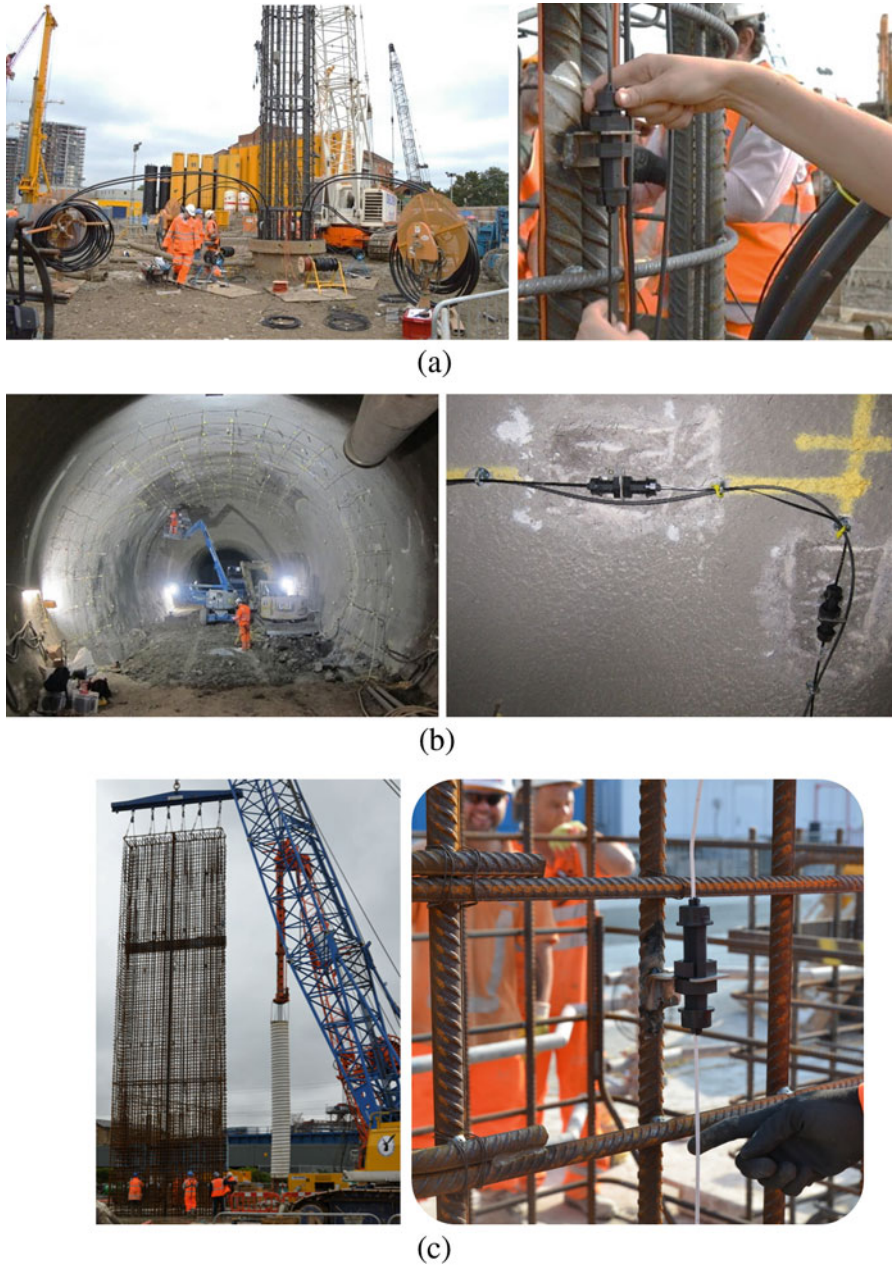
Example of optical fiber strain measurement. (a) Piles. (b) Tunnels. (c) Retaining walls
